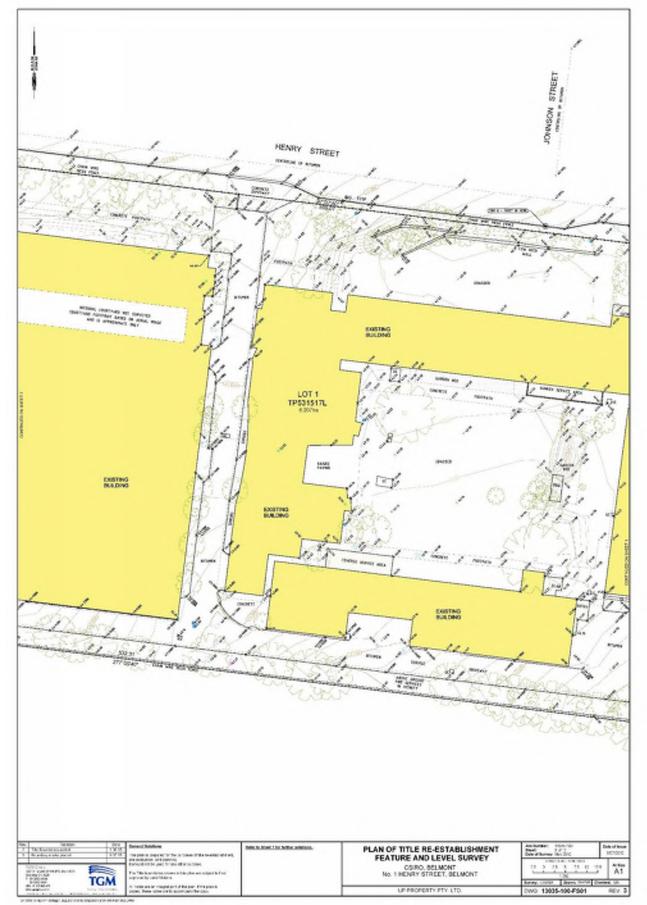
Site Feature and Level Survey (Sheet 3)
